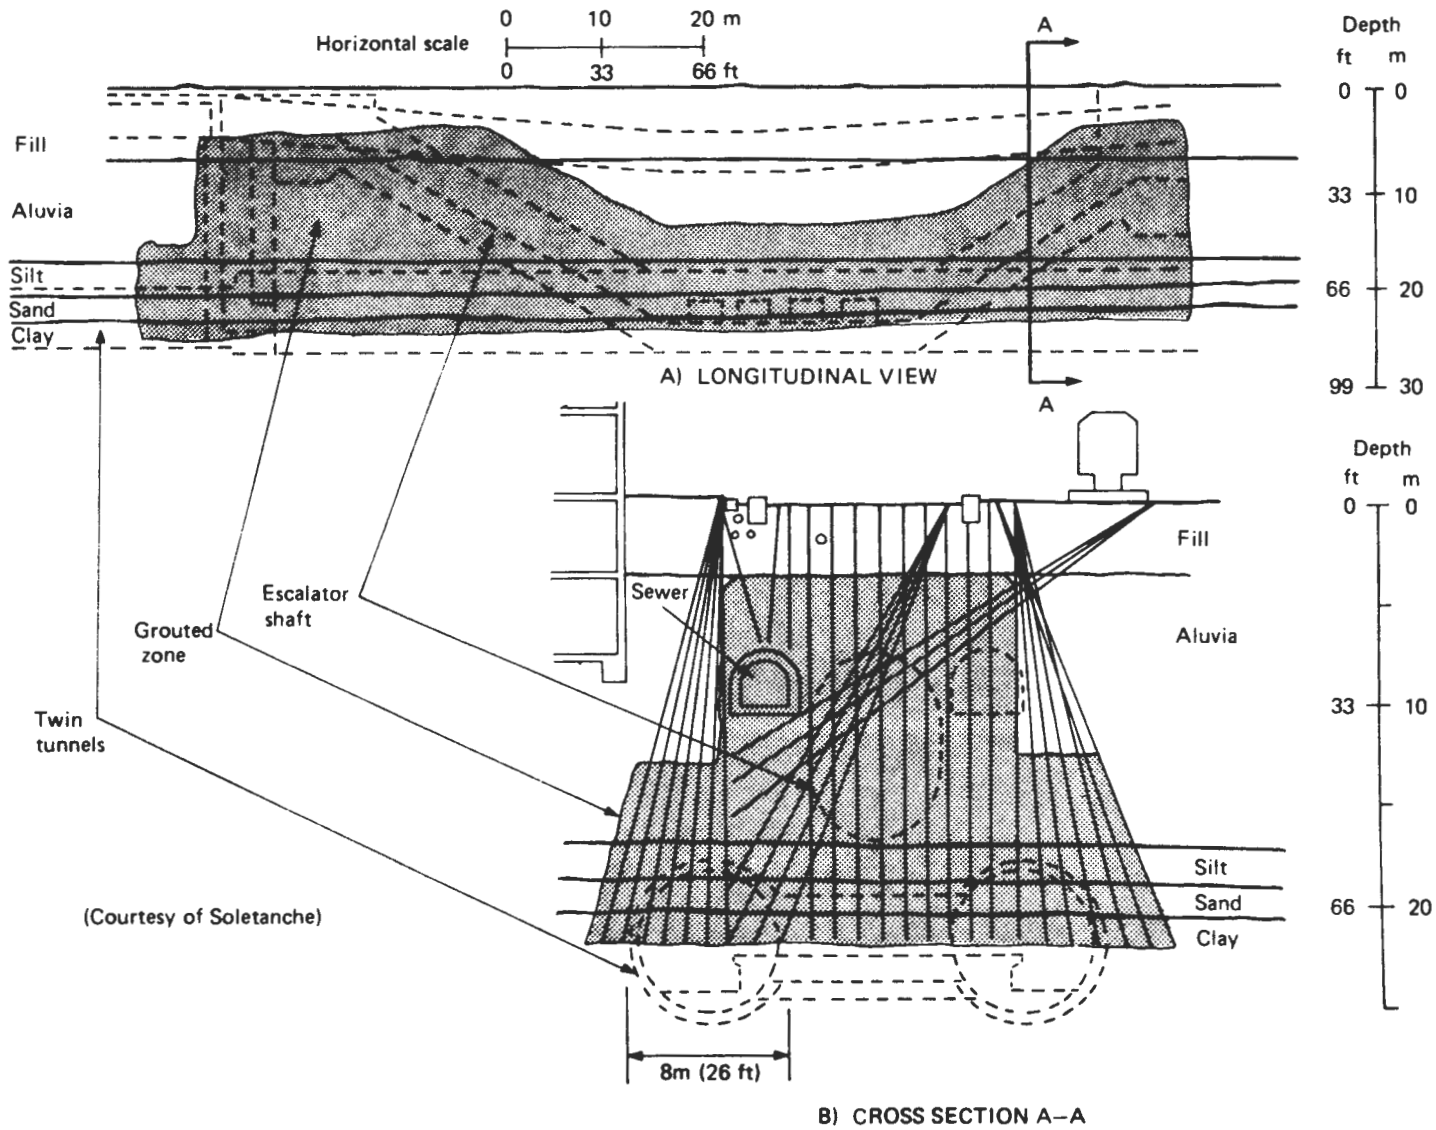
Grouting Scheme for Karlplatz Station on the Vienna Metro
